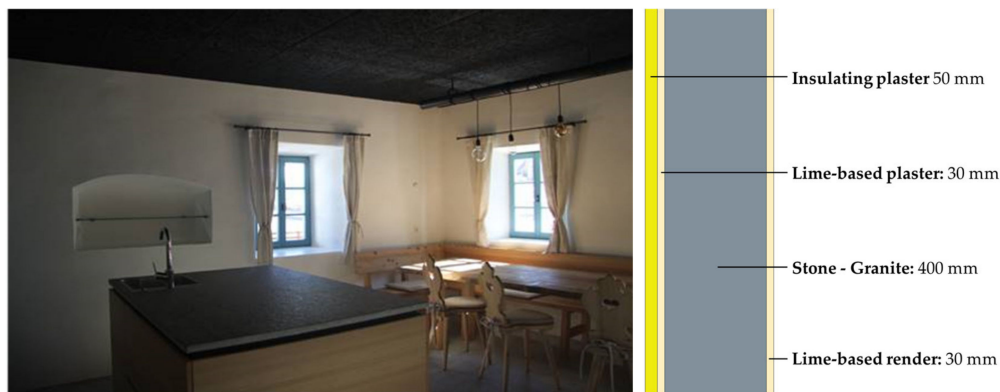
Example of internal wall insulation with insulating plaster: picture (left) and cross-section ((right), layers presented from inside to outside) [70].
